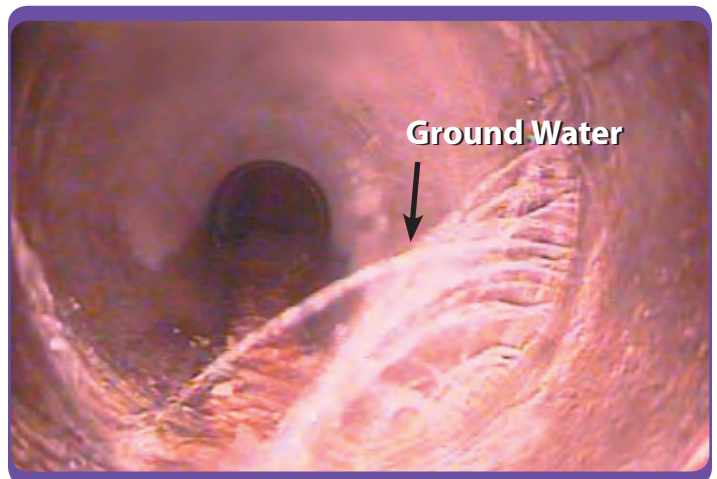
Groundwater entering a sewer pipe through cracks
